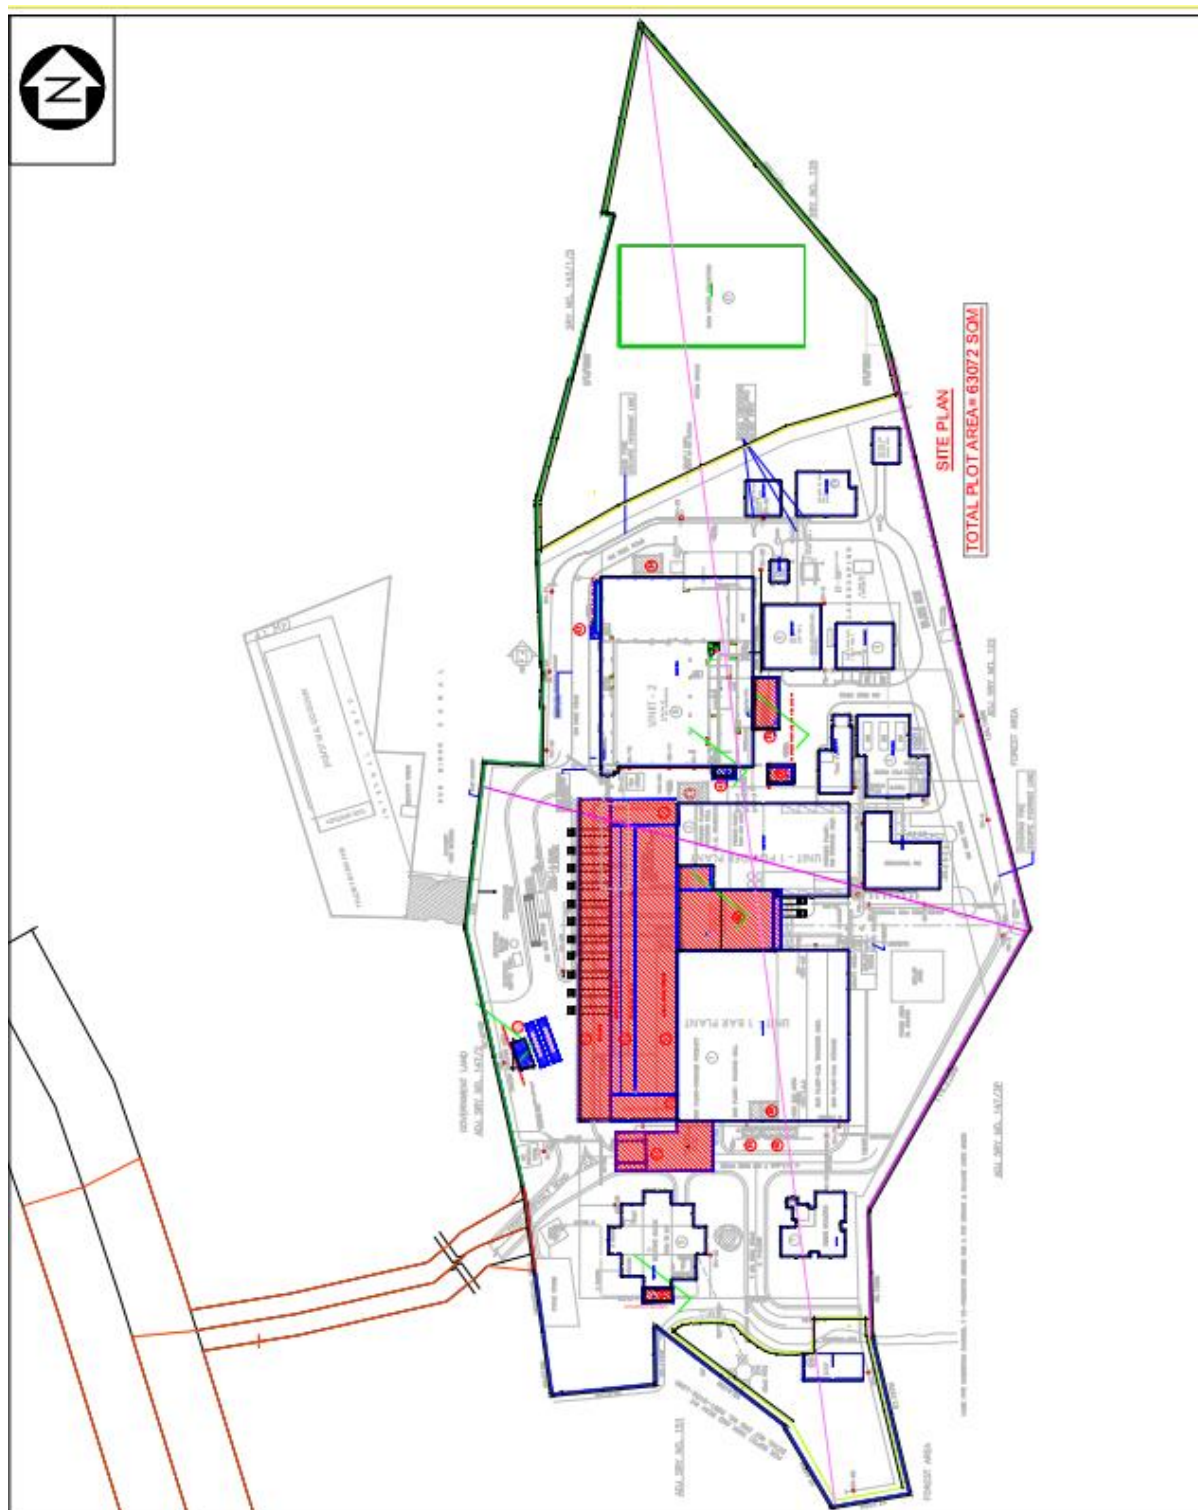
Plot Plan of existing & Proposed Plants and facilities
